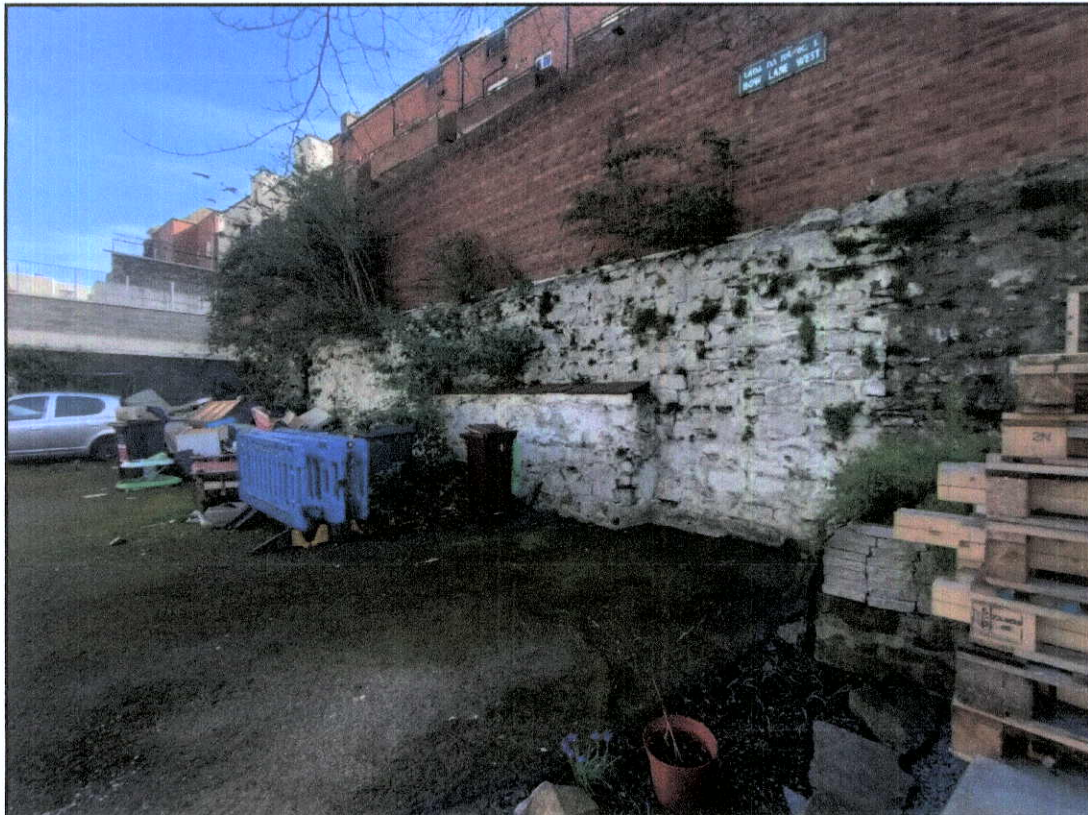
A 'Bow Lane West' sign on the rear boundary wall at top right.
